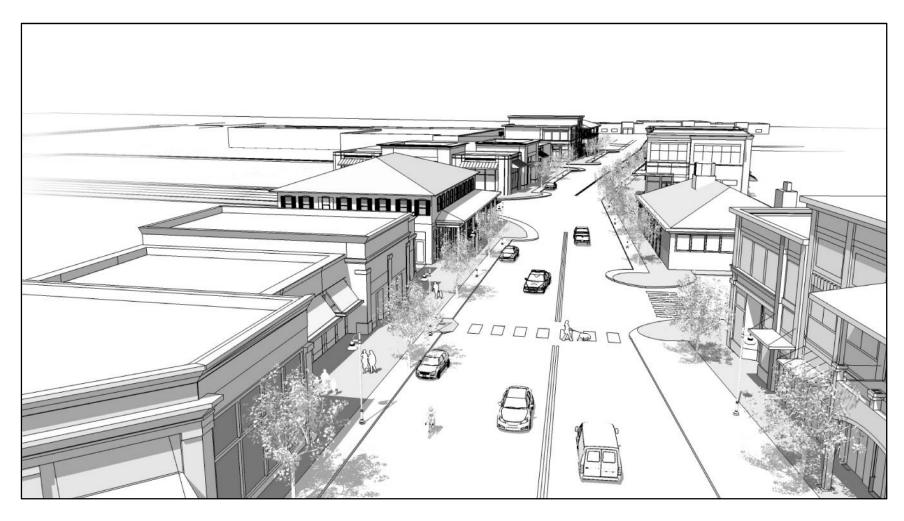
Bird's Eye View of Existing Access Road from Route 35 to Shaw's Plaza with a Conceptual Complete Street Retrofit
